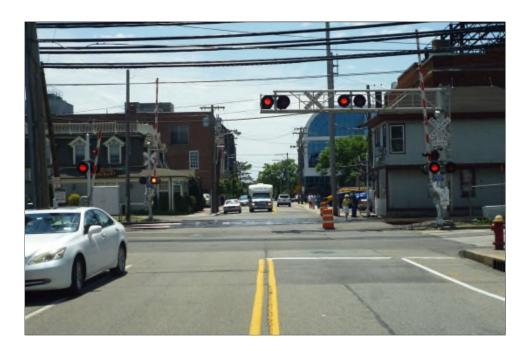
Main Street, Mineola grade crossing looking south. Note frame structure on southwest corner of crossing – the LIRR's Nassau Tower, a potential property taking, which is likely to be demolished for installation of the third Main Line track.
